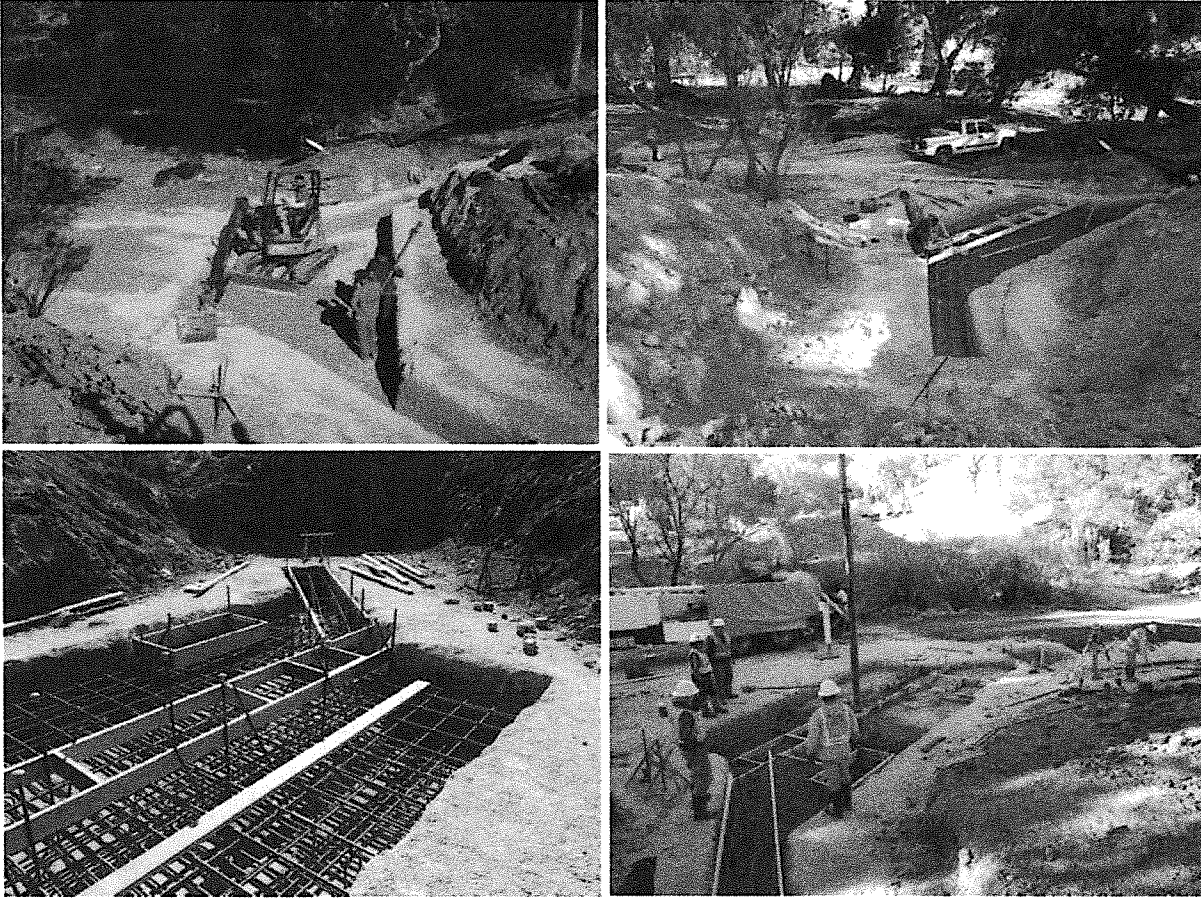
Bridge footing/foundation preparation, rebar placement and pouring.
